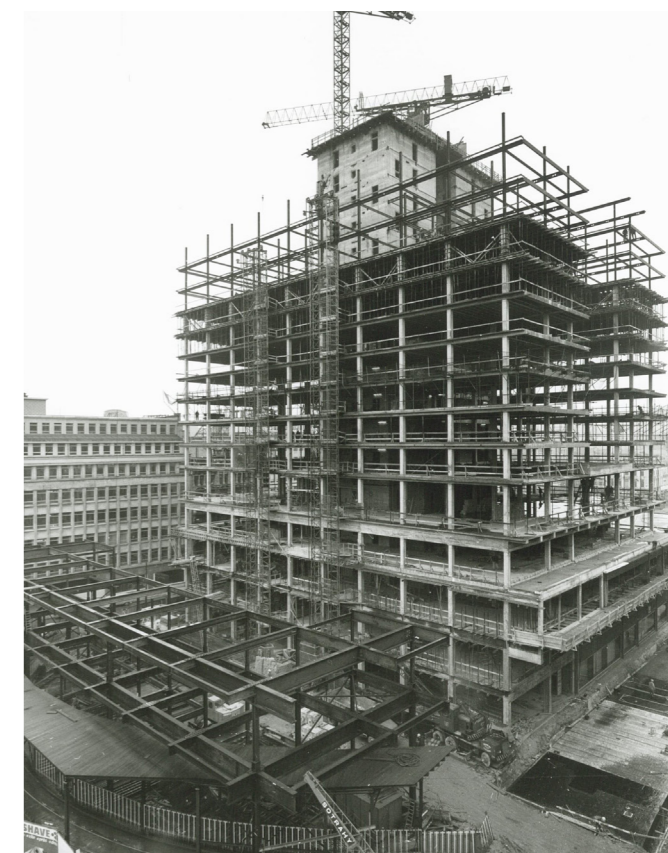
Philips tower under construction. Situation on 22 February 1968. Archive Jose Larose. Used with permission.
